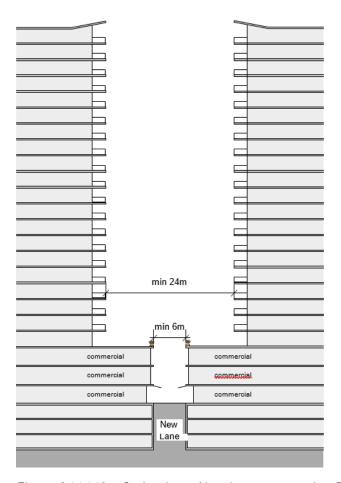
Setbacks to New Lane connecting Rawson Street to Beecroft Road
